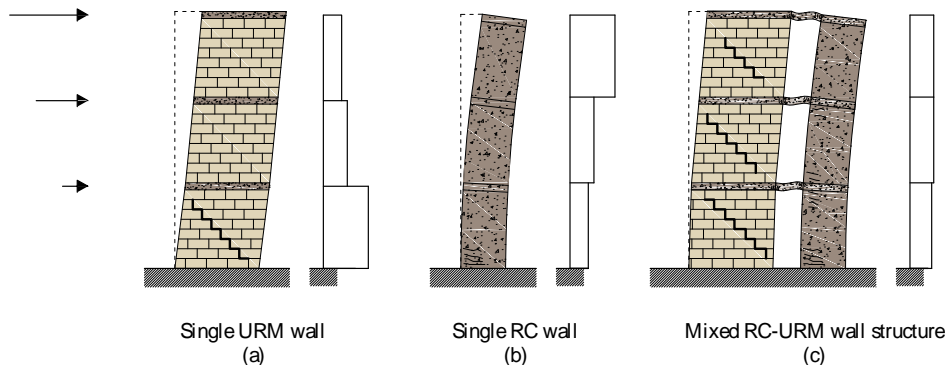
Deformation pattern and inter-storey drift profile due to lateral forces of a single URM wall with dominant shear behaviour (a), a single RC wall with dominant flexure behaviour (b) and a mixed RC-URM structure (c) [29].
